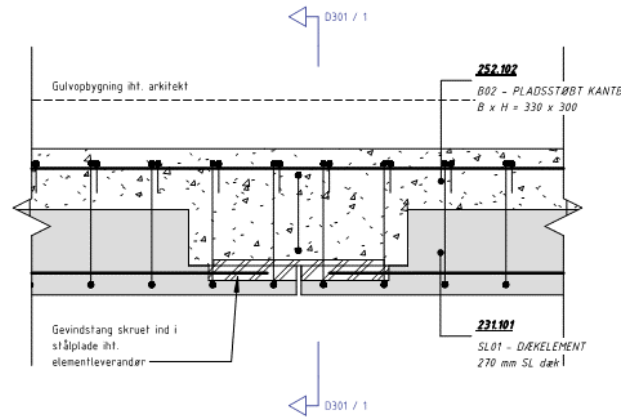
A Place To – Steel plate splice in integrated composite ring beam © Abeo / BIG Engineering
